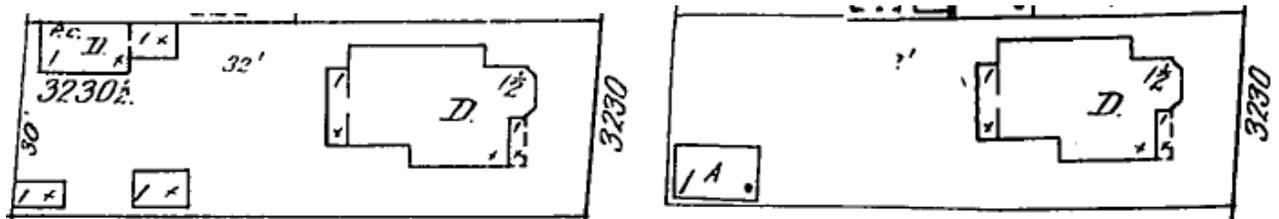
Site plans of 3230 Ellis Street in 1911 (left) and 1950 (right). North is up.
